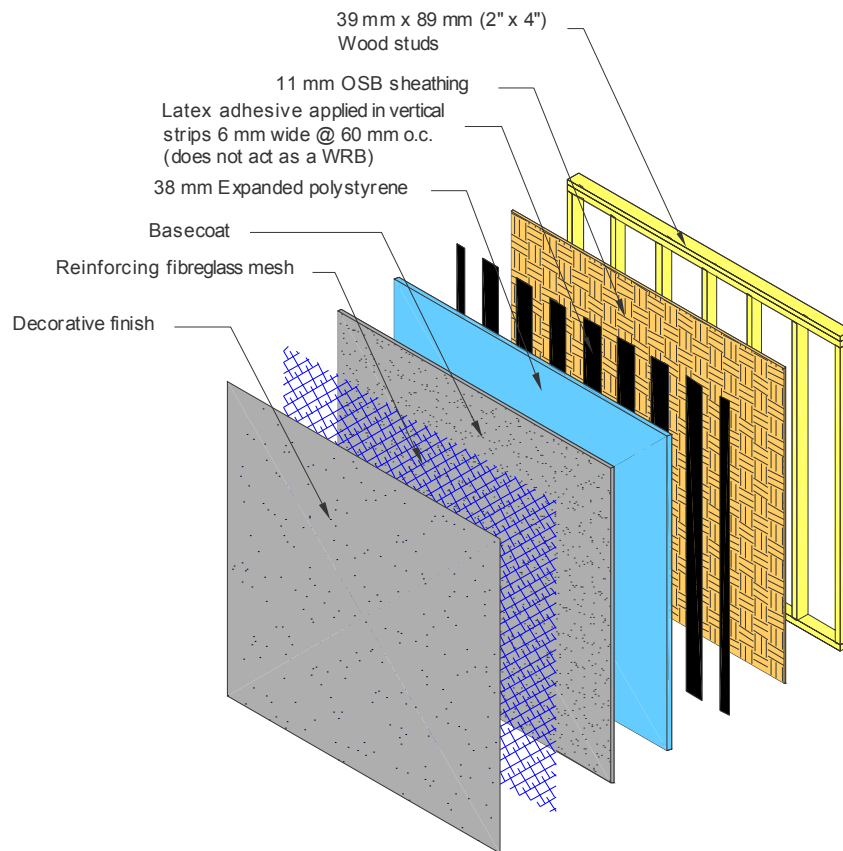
EIFS-clad wall assembly (specimen No. 6) with no WRB in the field of the wall.
